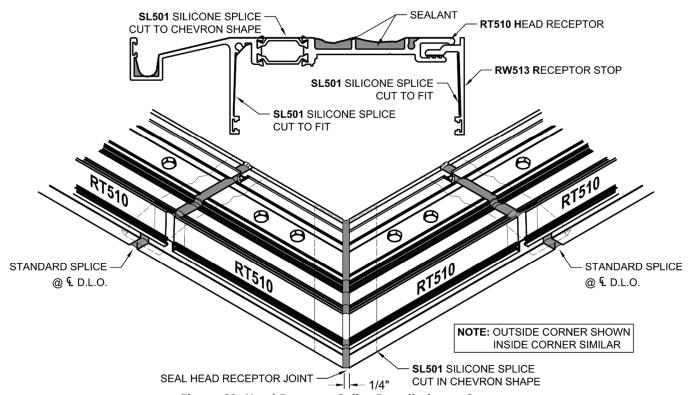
Head Receptor Splice Installation at Corners (Outside Corner shown, Inside Corner similar)
